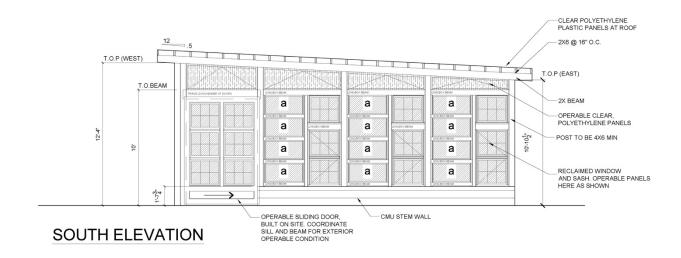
Detailed Construction Drawing of the Southern Facade of the E. 34 Greenhouse c/o Emergent Structures
